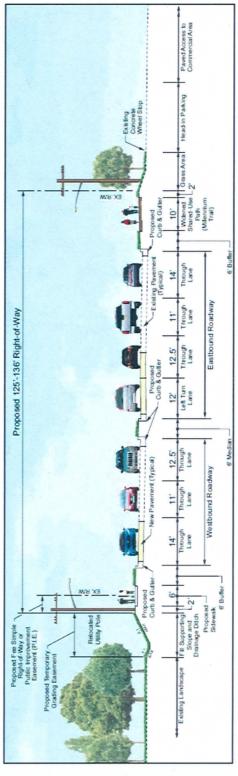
Alternative 3: Enhanced Master Plan, Recommended Alternative. Proposed typical roadway along East Gude Drive at Section A-A, approximately 1,000' east of Calhoun Drive.
